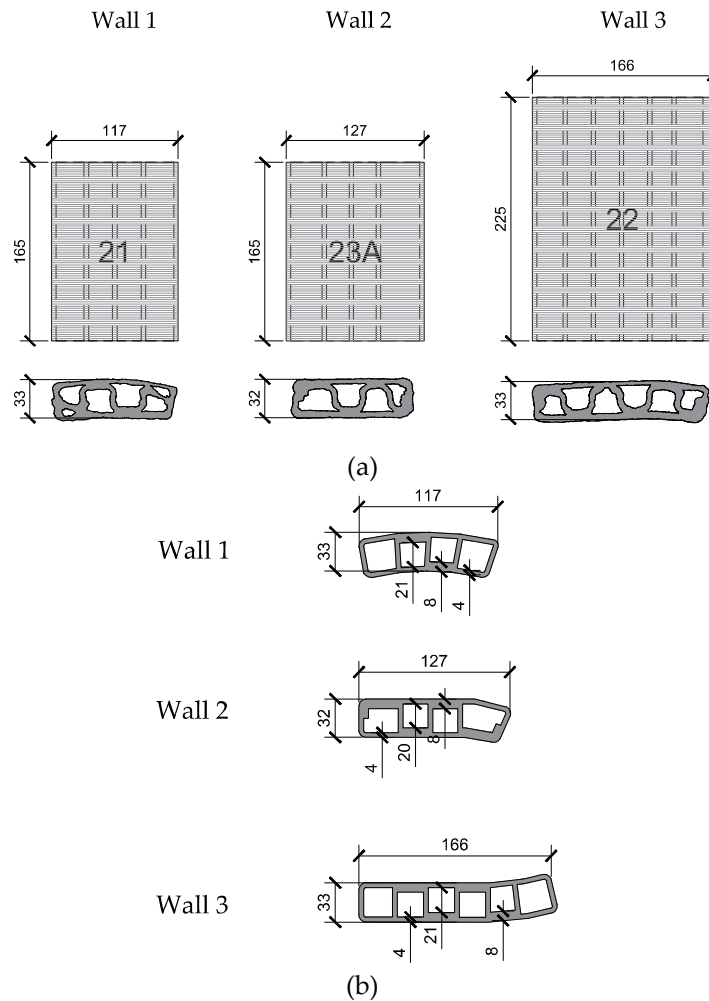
(a) Size and shape of the 3D printed concrete walls, (b) cross-sections with dimensions.
